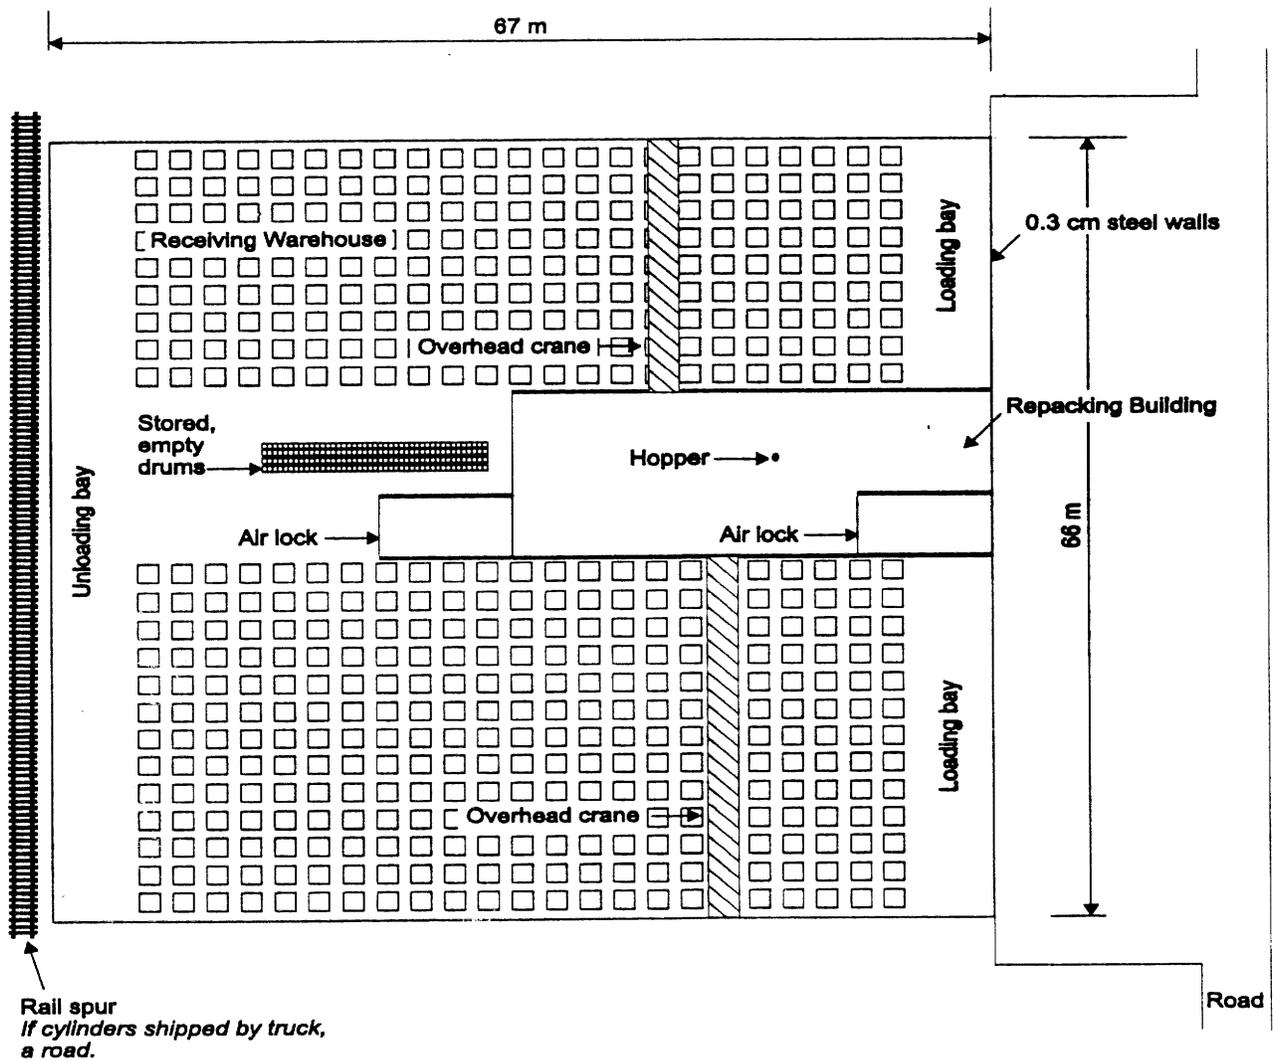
Plan View of Receiving Warehouse and Repackaging Building UF_6 Storage in
